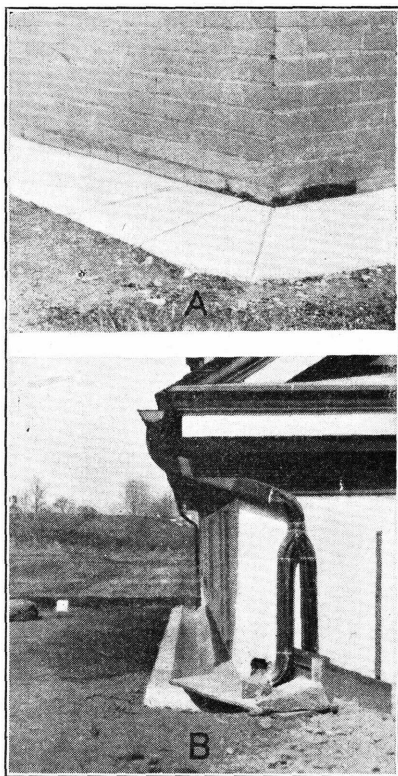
Sloping concrete pavements about 18 inches wide: A, Shedding water from a cellar wall; B, conducting water along a cellar wall
